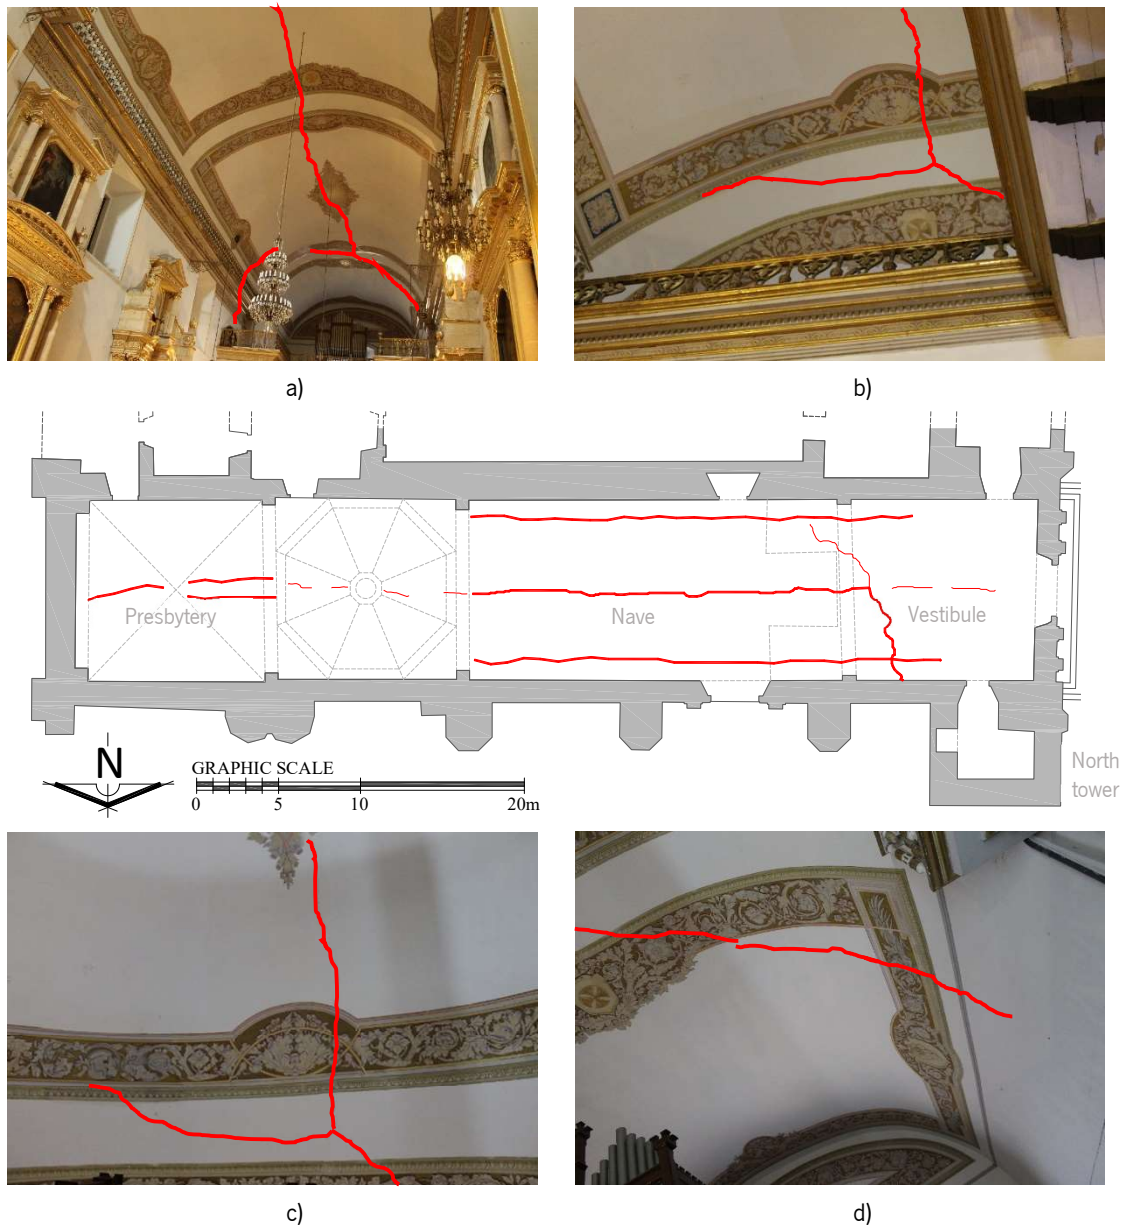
Damage at the intrados of the vaults: a) longitudinal and transverse cracking; b) change of crack direction; c) crack leading to the north wall; d) damage at presbytery's groin vault.
